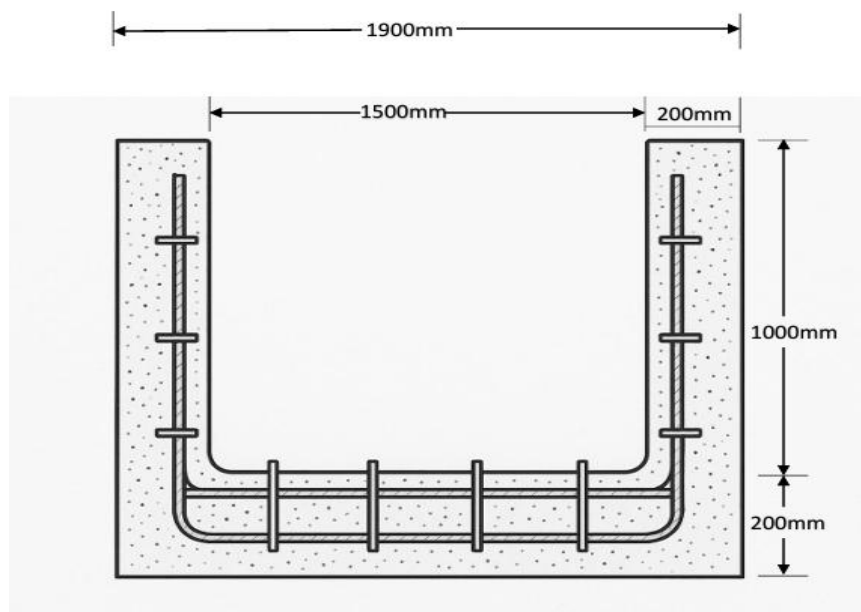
Cross-sectional view of recommended drainage design for Okpanam and Cable Point roads
